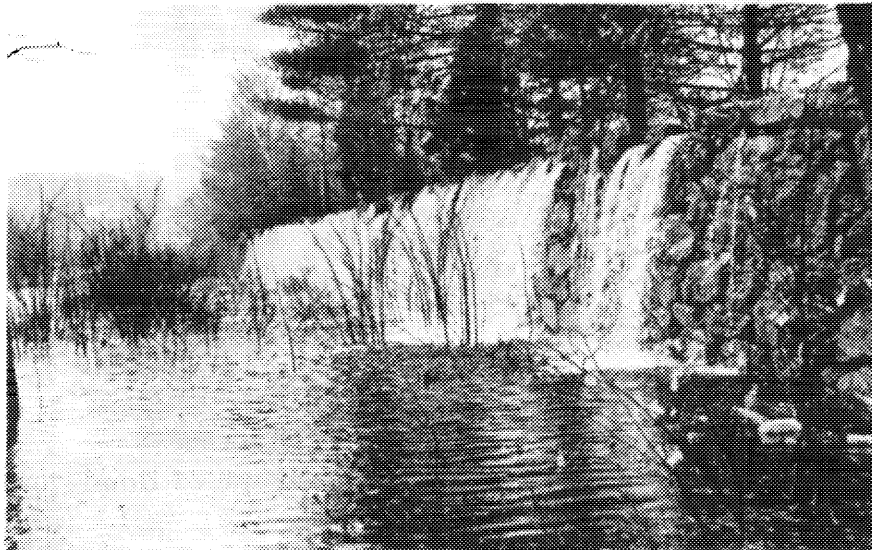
Poquanticut Brook Station 25+00. Photograph of New Pond at Foundry Street being overtopped. (Courtesy of Mr. Allan Watts)
